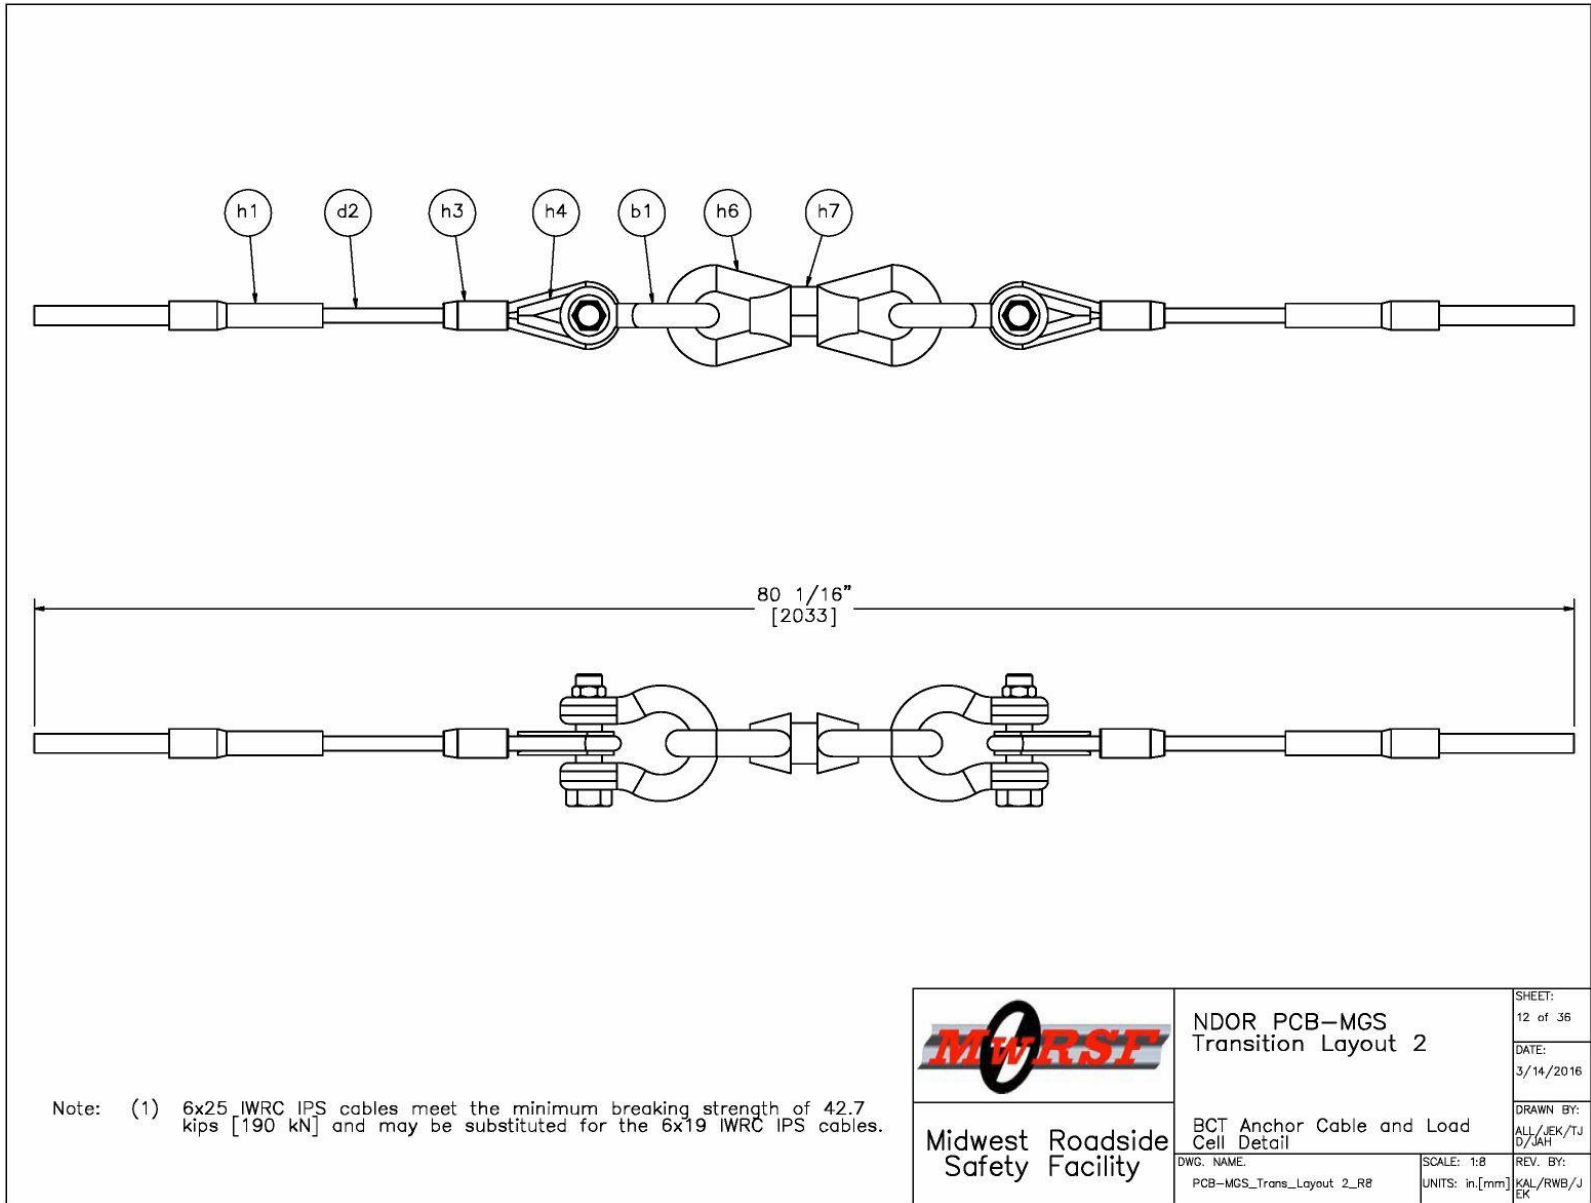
BCT Anchor Cable and Load Cell Detail, Test No. MGSPCB-1
